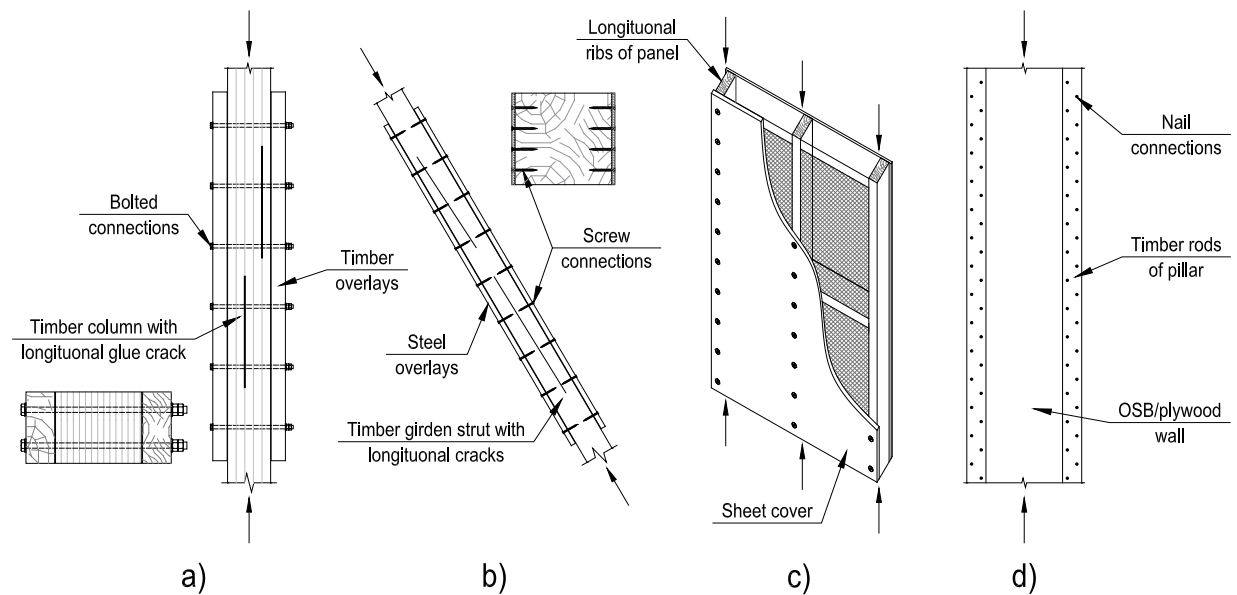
Component timber composite elements: a – glued timber column with longitudinal cracks reinforced timber overlays with bolted connections; b – timber girder strut reinforced steel overlays with screw connections; c – wall panel with sheet cover included in the joint work with ribs; d – I-section pillar with timber chords and sheet material wall (plywood, OSB, etc.).
